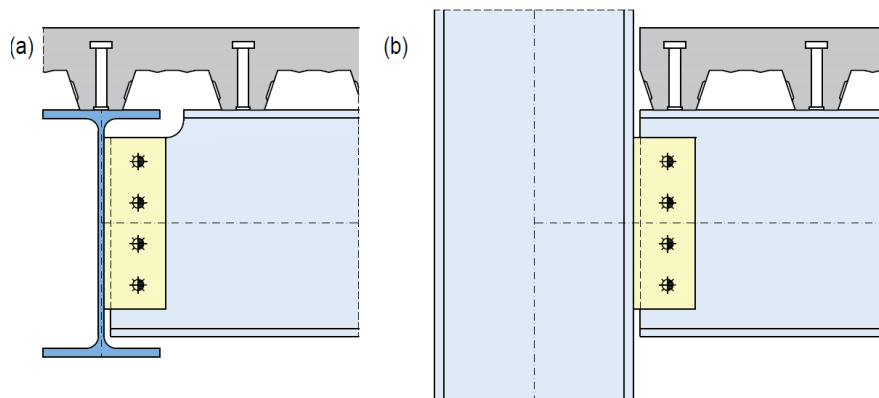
Nominally pinned joints: (a) between steel-concrete composite floor beams, (b) between secondary floor beams and columns
